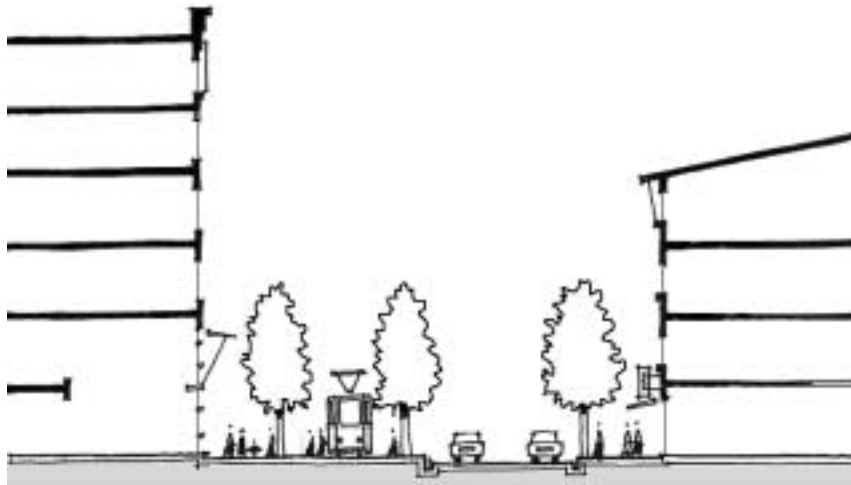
Section: 80' Right of Way. Wide sidewalks, light rail, travel lane, bus and loading lane
